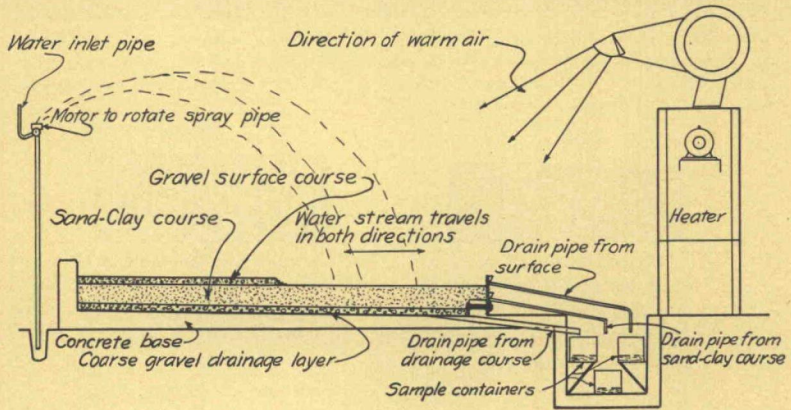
Cross Section of Indoor Test Road. (From Dow Chemical Co.)
